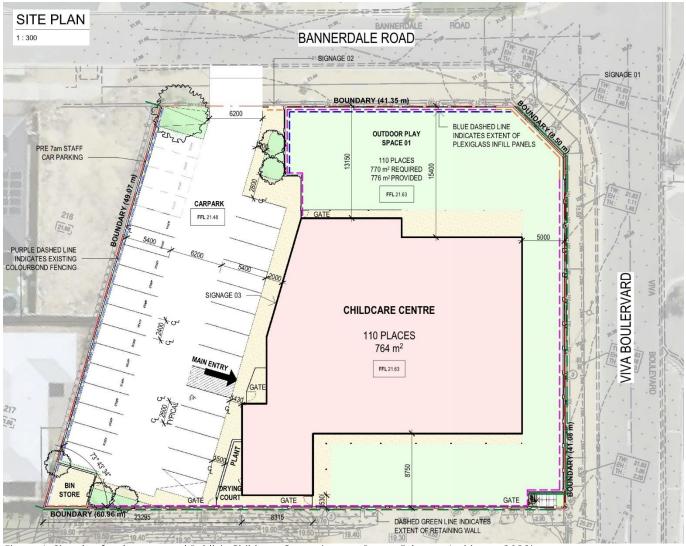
Site plan for the proposed Baldivis Childcare Centre (source: Brown Falconer Architects, 2022)
